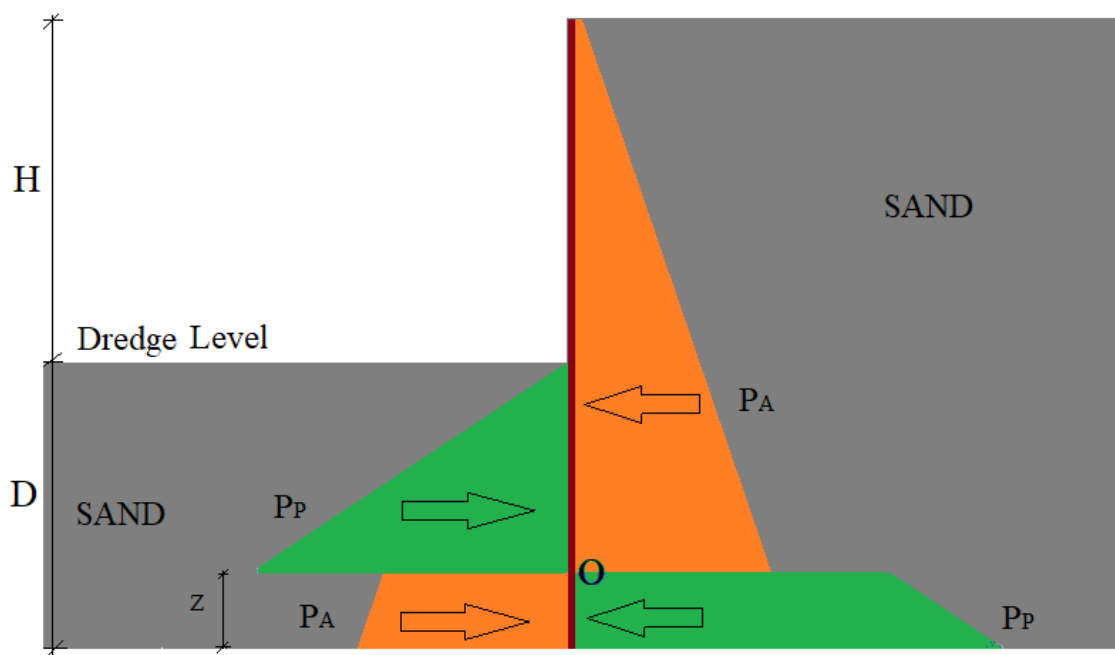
Lateral Earth Forces (P_A , P_P) Acting on the Cantilever Sheet Pile Wall
